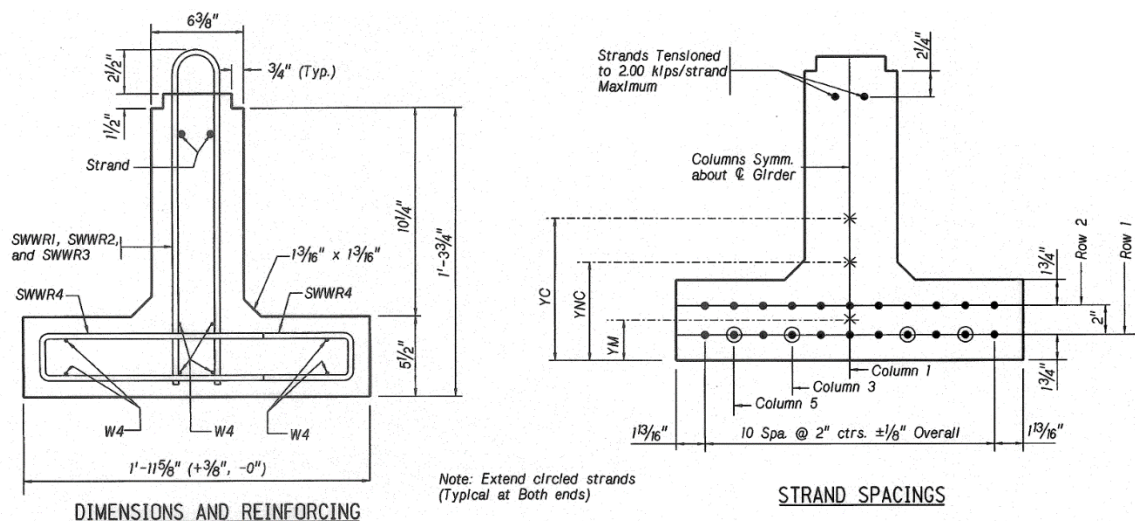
Drawing of the dimensions, reinforcement, and strand layout for a typical IT-400 girder (courtesy of NDOT).
